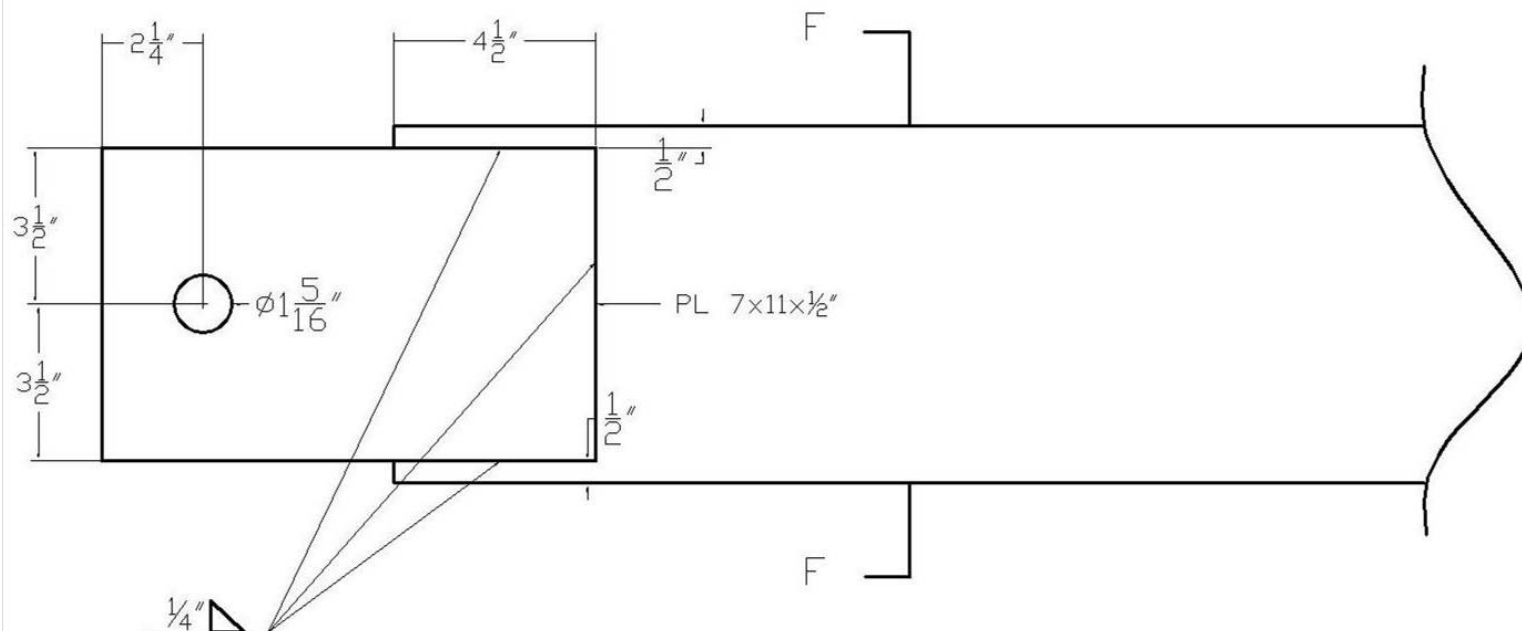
Details for end of member F of 1/10<sup>th</sup> scale model
